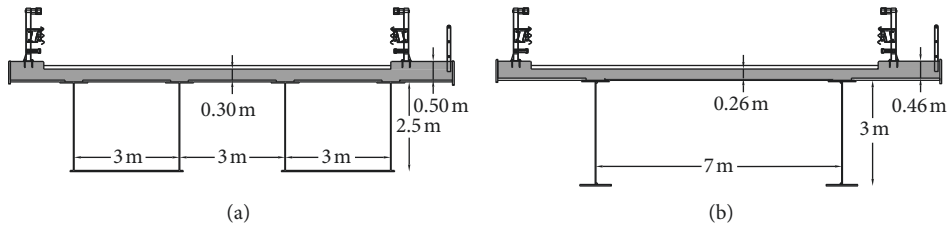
Cross sections of the two bridge design alternatives (D1 and D2).
